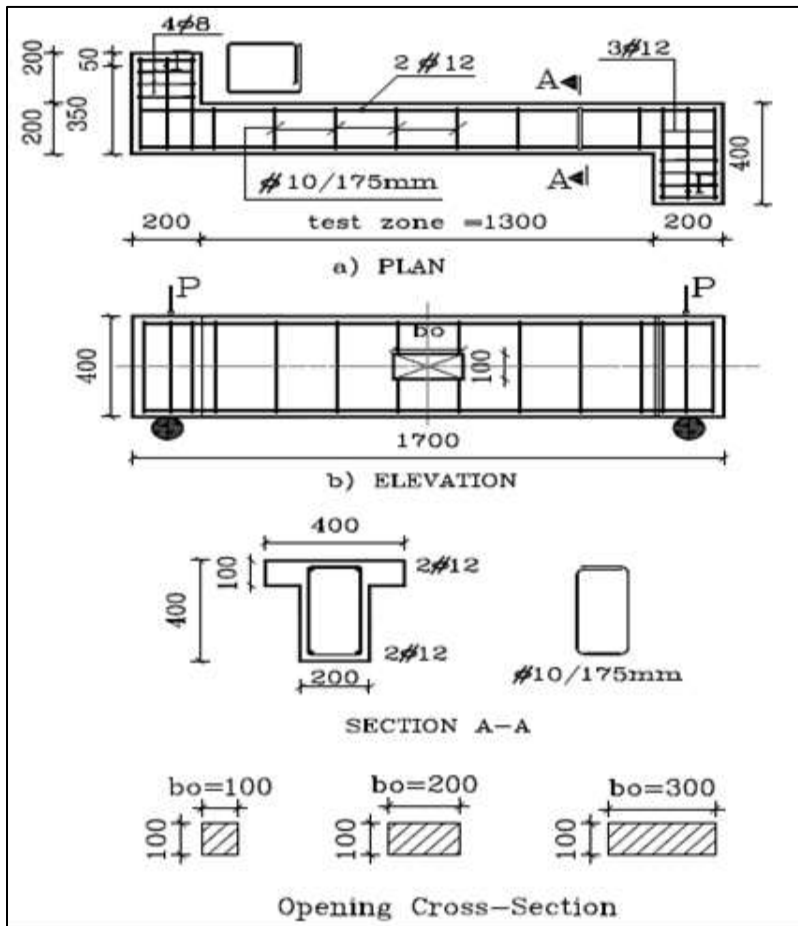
(b) Dimensions and details of reinforcement of beams. With web opening
